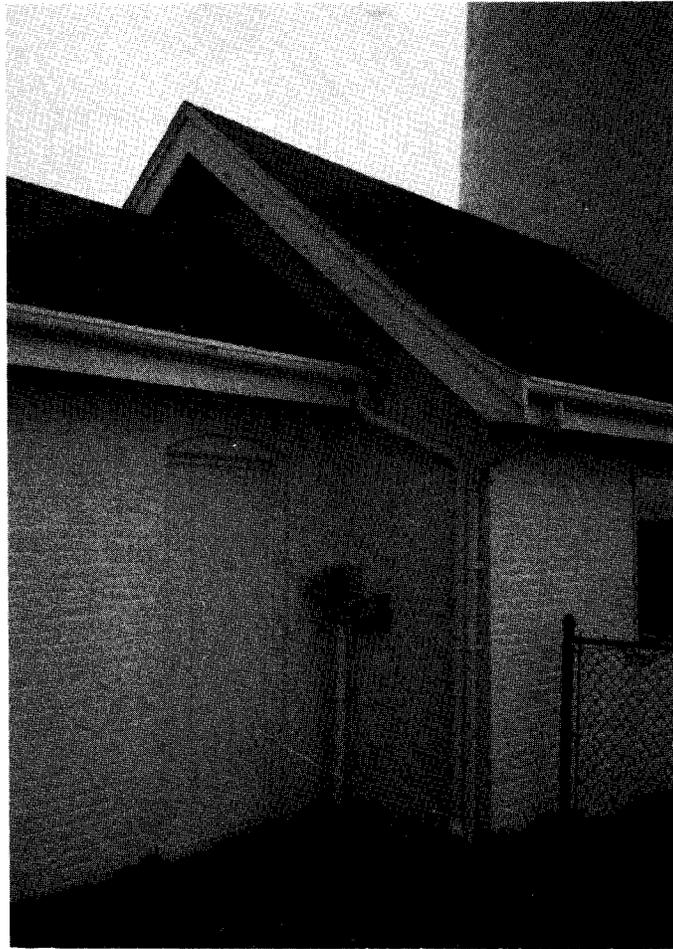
Connector at the Keeper's Dwelling and Tower Connector, west elevation: blocked entryway, outlet tubes, and downspouts.
